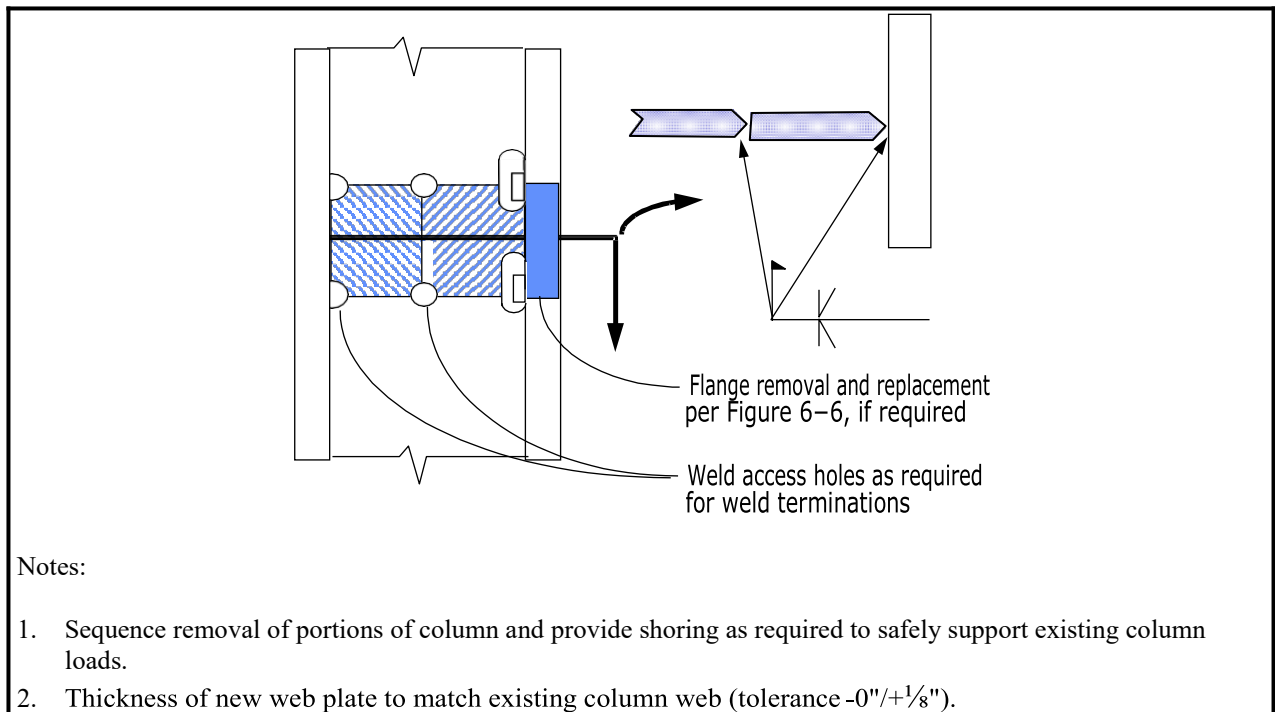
Alternative Column Web Repair - Columns without Doubler Plates
